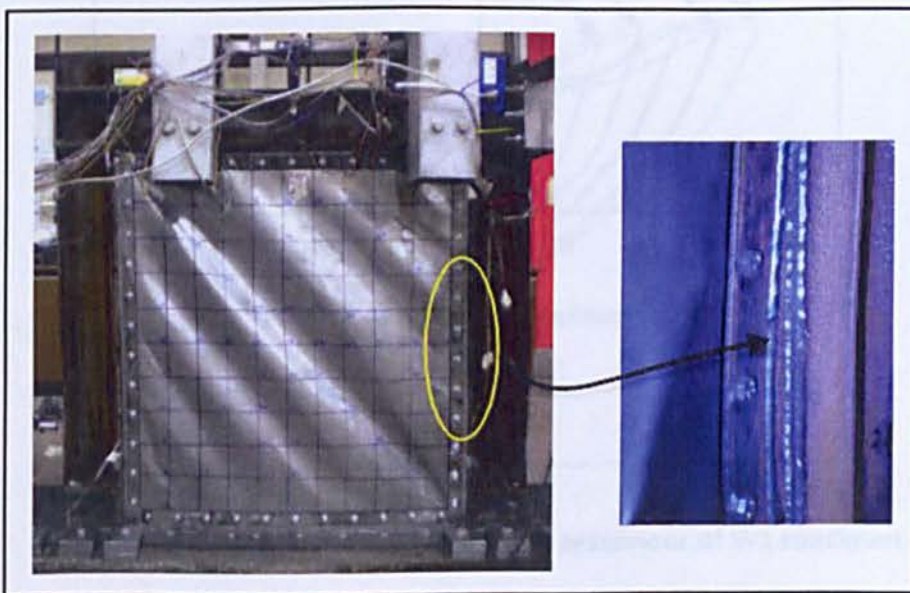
Weld fracture of connection between fish plate and right column for W1 specimen
